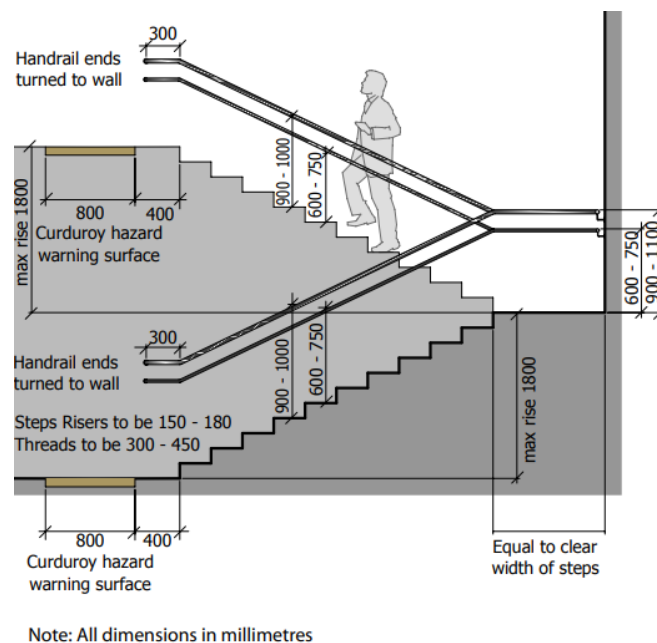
International staircase (retrieved from <http://universaldesign.ie>)
